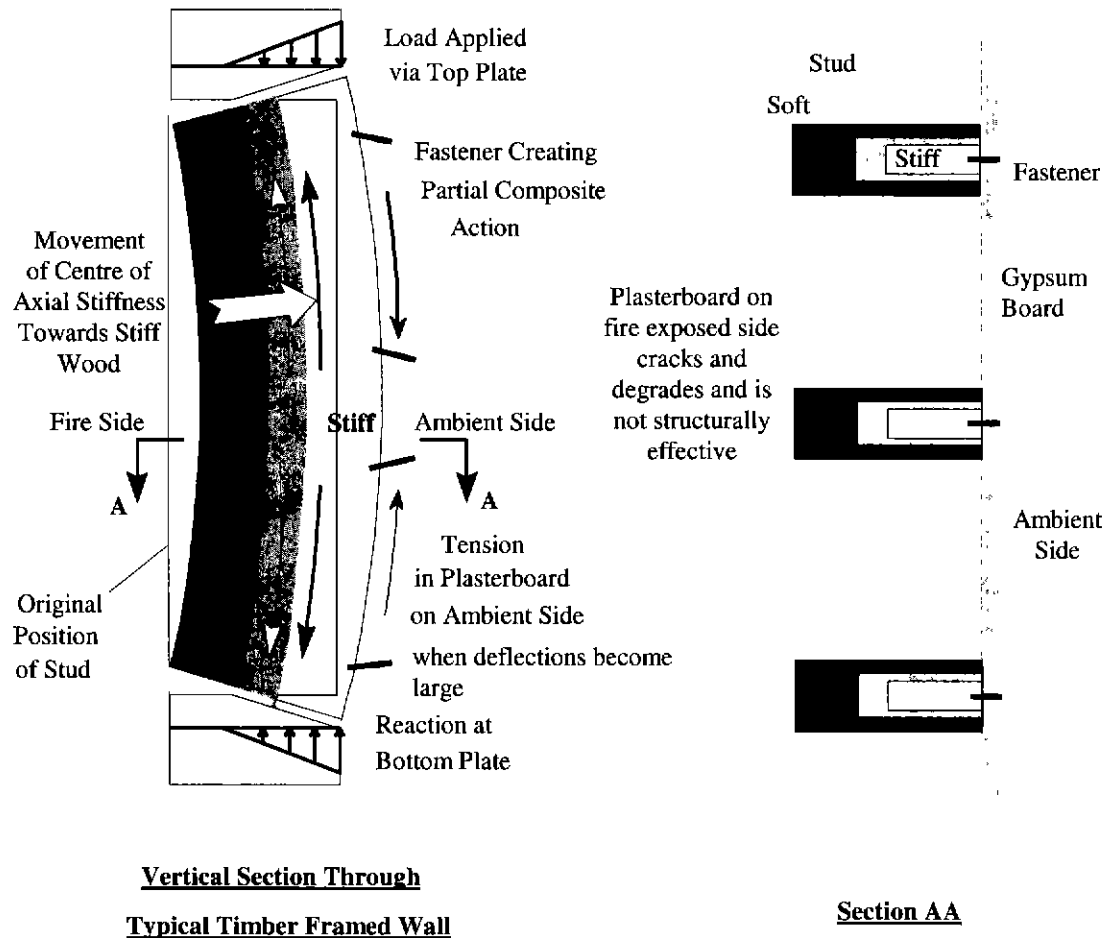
Schematic Diagram Detailing the Response of a Timber-framed Wall Exposed to Fire
